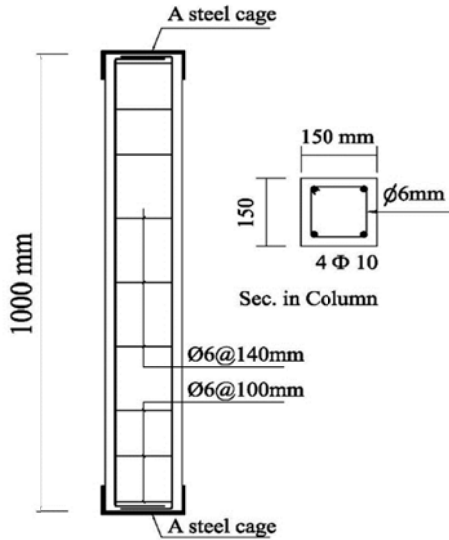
Columns designations, dimensions and reinforcement arrangement.
